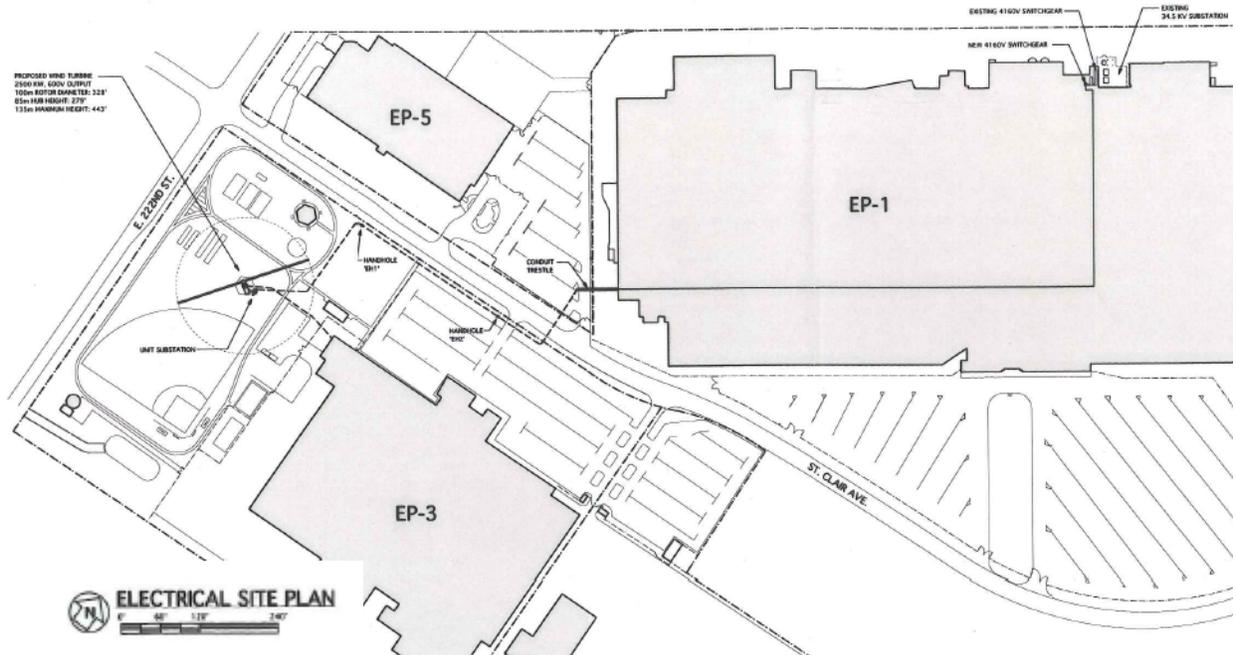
LEC Wind Turbine Electrical Site Plan.
